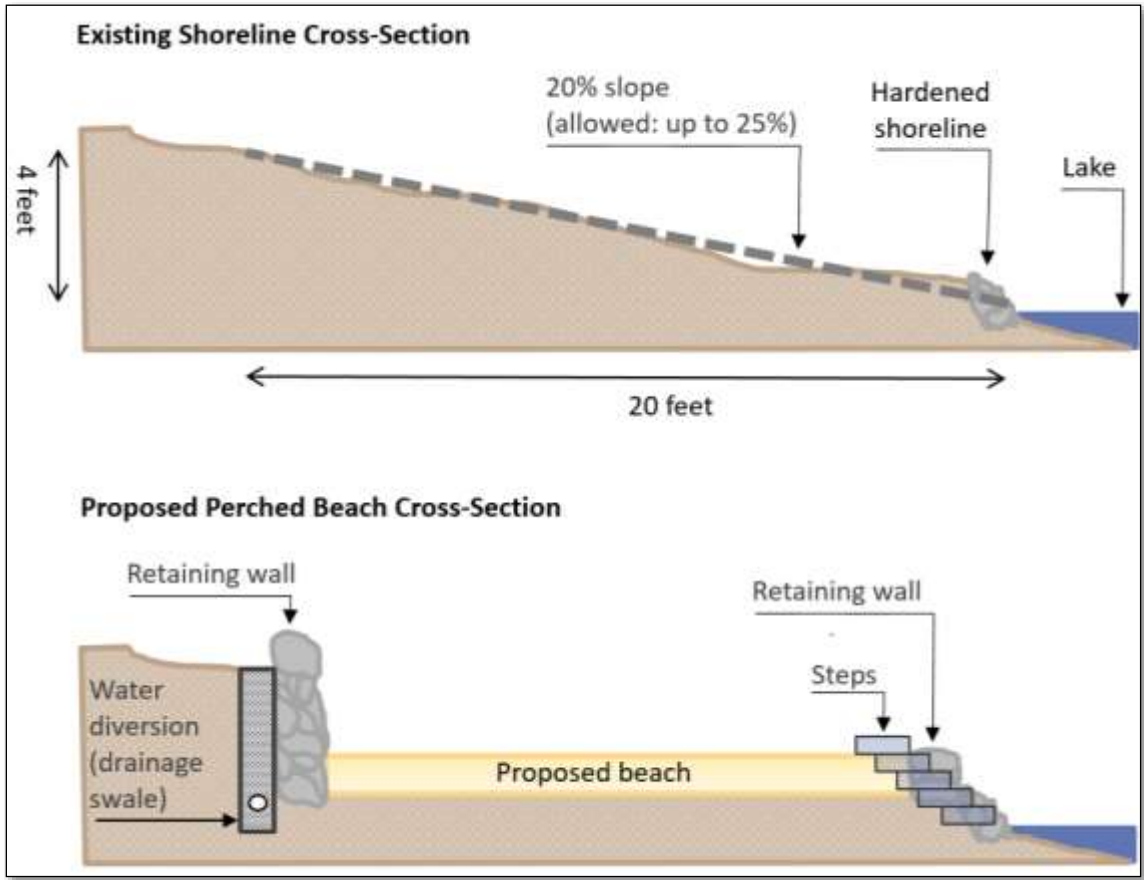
Cross-section of a proposed water access structure. Note that the proposed beach has zero slope and will be located landward and above the existing hardened shoreline. This hardened shoreline will remain intact with the exception of material that must be removed for the installation of steps to access the water. In this example, a drainage swale will be installed to divert surface runoff around the water access structure.
